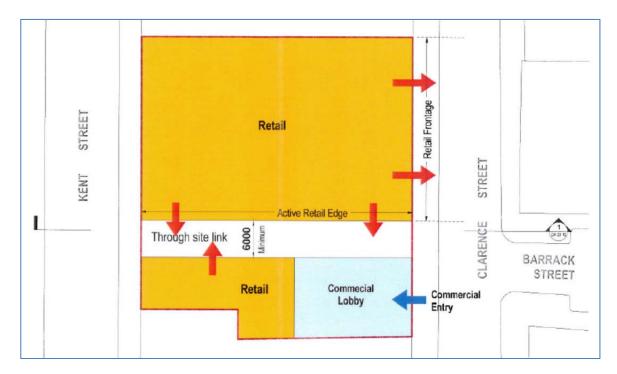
The Stage 1 DA approved ground floor level building footprint (with zero setback from either street frontage)
